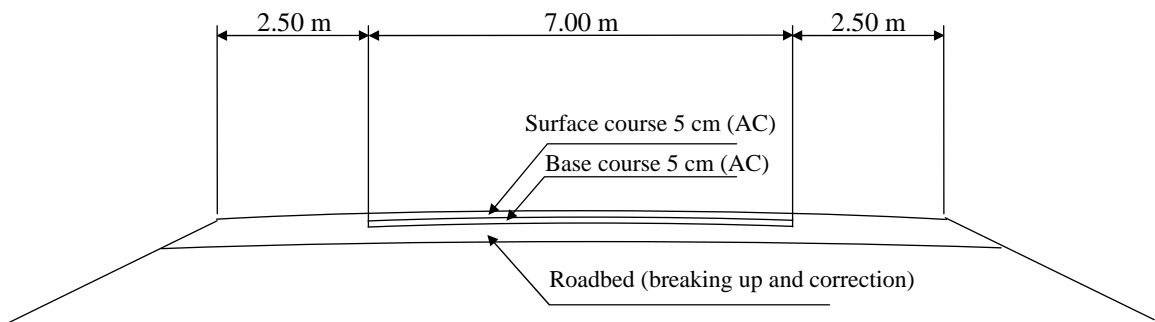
Hypothetical Cross Section of Repavement
